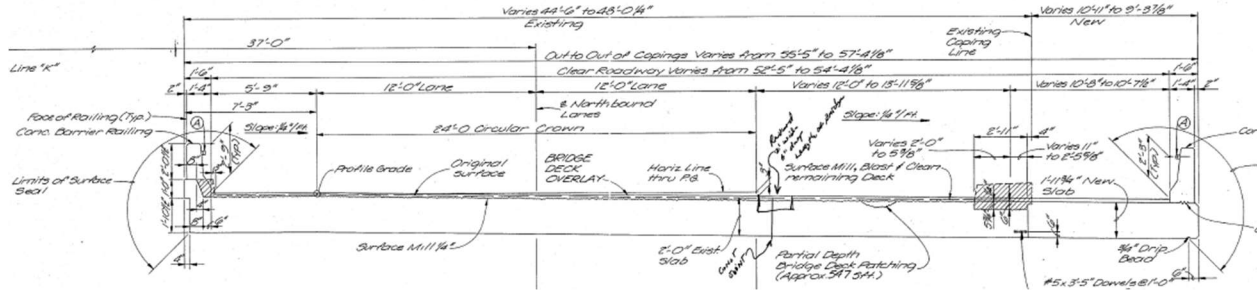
Typical Section of Bridge (NBI 14650) (1991)
